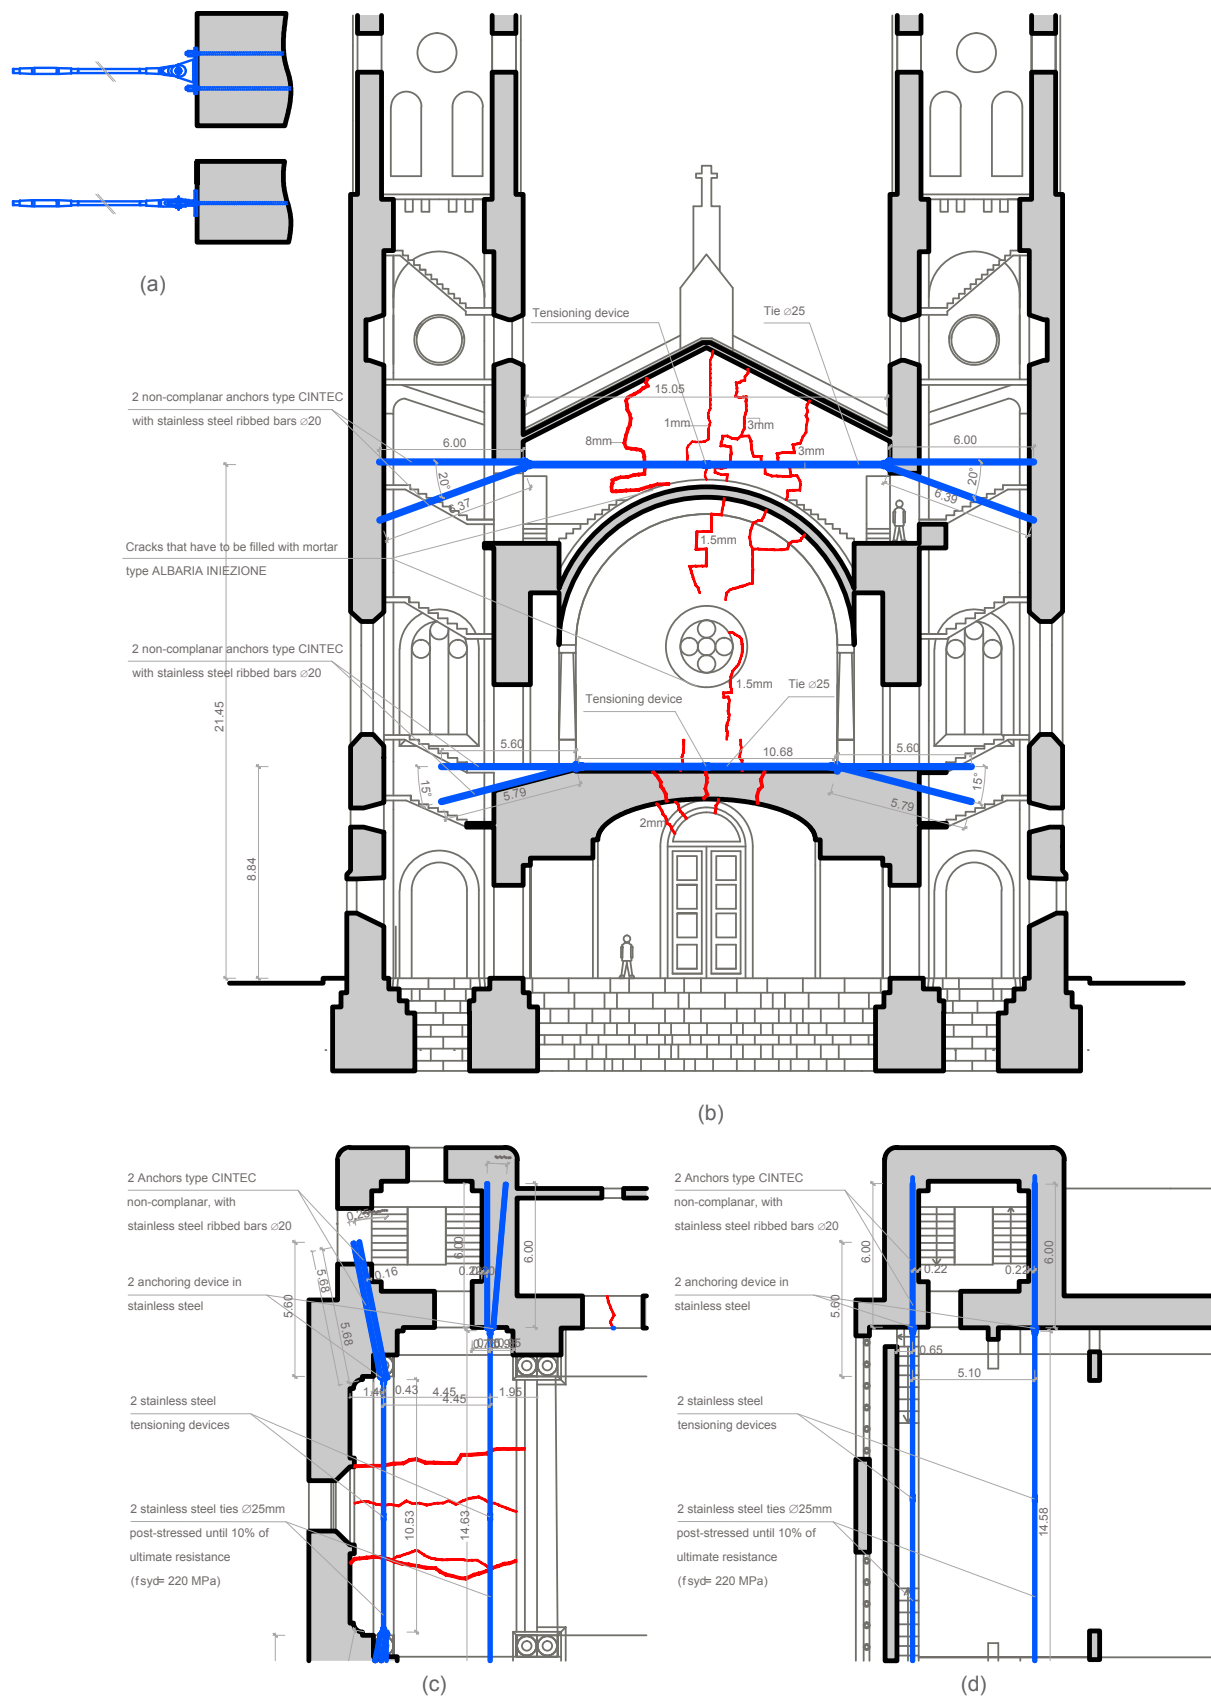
The system of anchoring designed by professor Ramos: (a) detail of the connection (b) section (c) plant at the choir level (d) plant at the vault level
